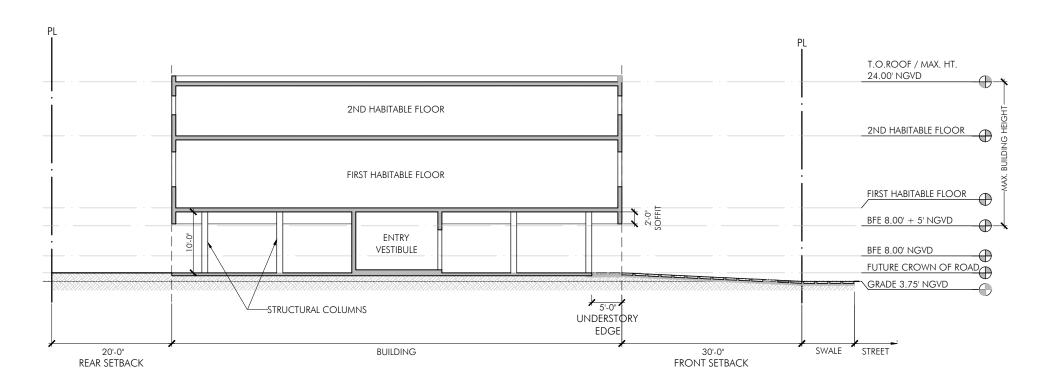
EXHIBIT B: PROPOSED CONDITION 100' LOT (SITE PLAN)
